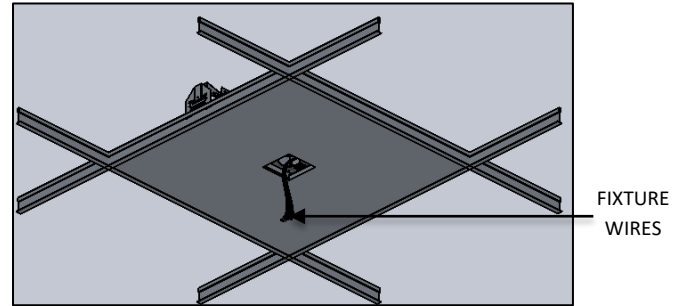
ASSEMBLED VIEW SHOWING RECESSED J-BOX TO THE CEILING
